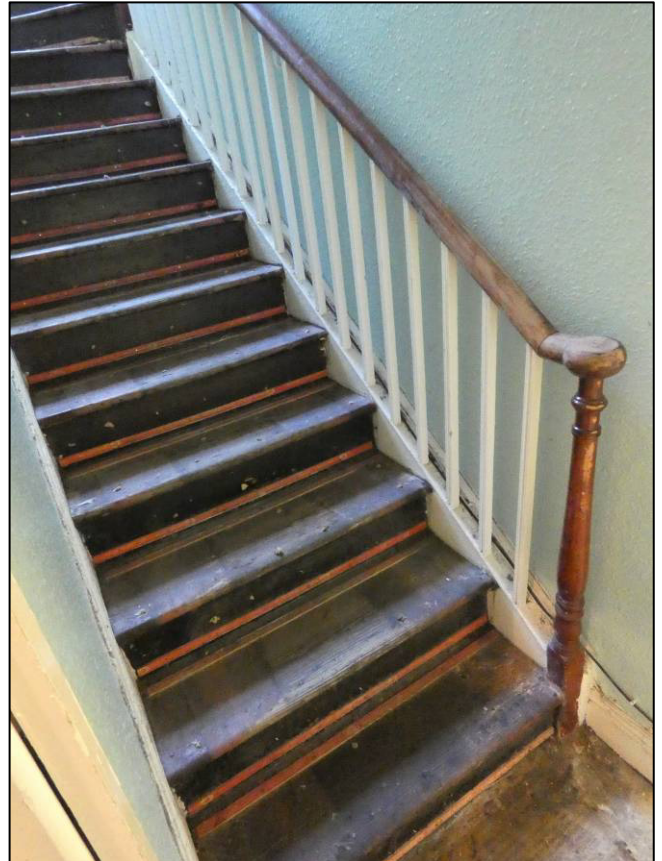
Room GF1, stairs, looking S (photo 1/858).
